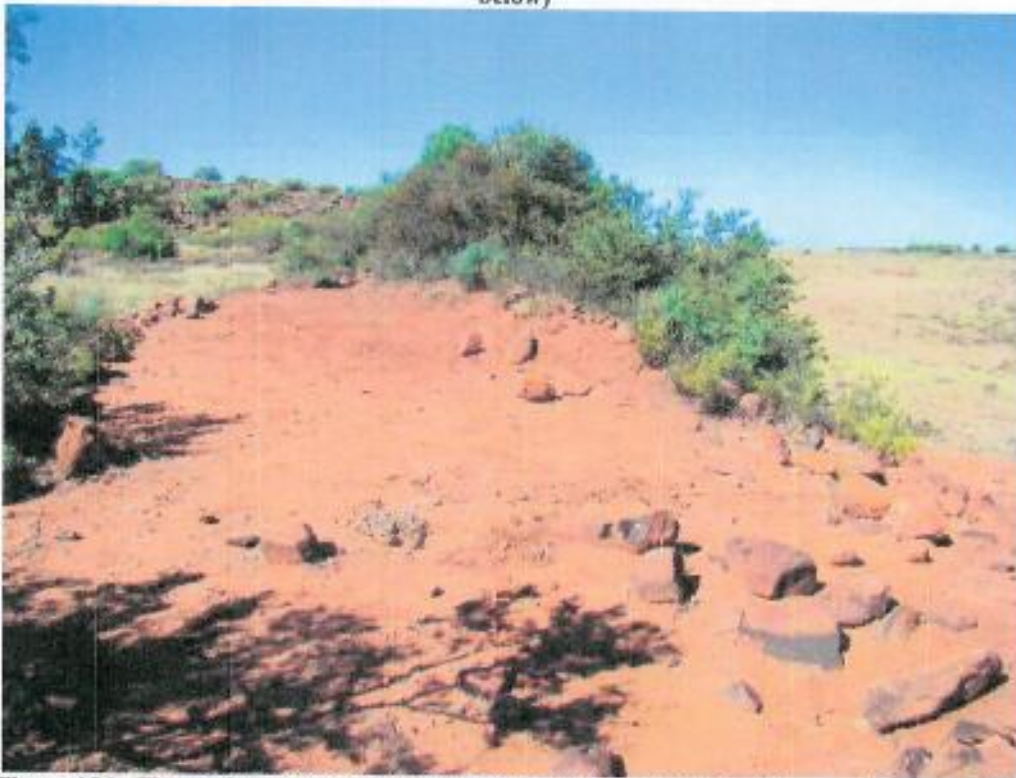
Flat surface on top of terraced retainer wall for dam is wide enough for a vehicle
